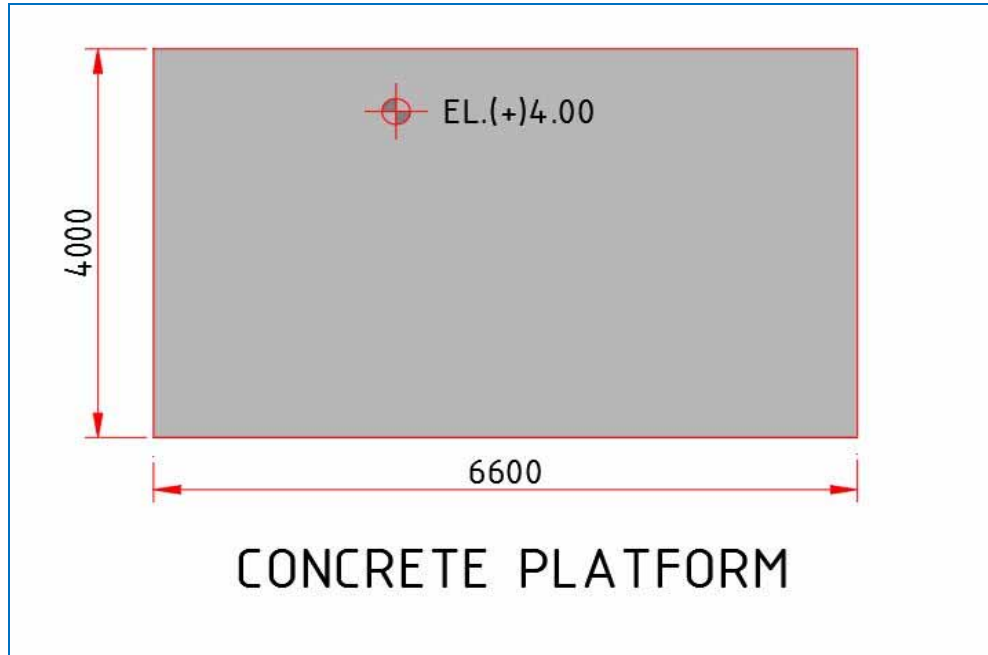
General arrangement of Concrete Platform at Bank (Sadasivgad/Katne)
